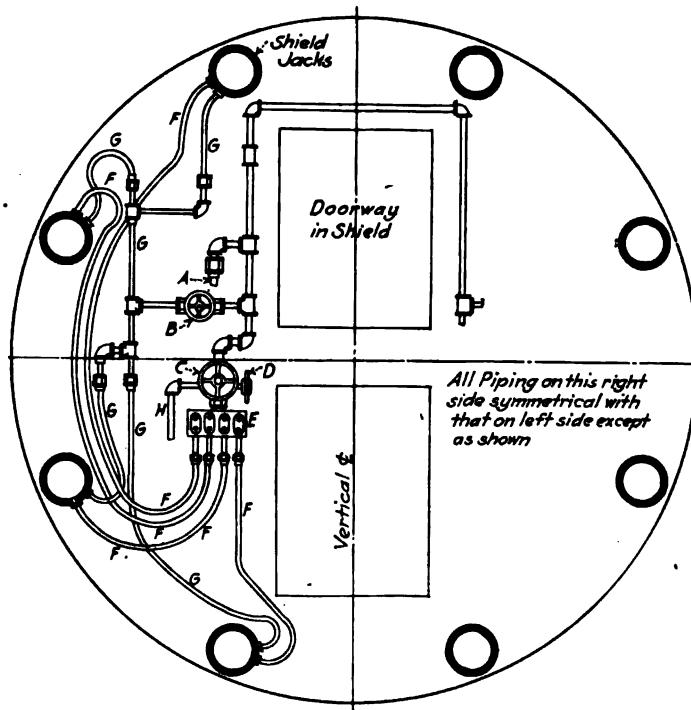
Diagram of hydraulic piping and valves on a shield.
